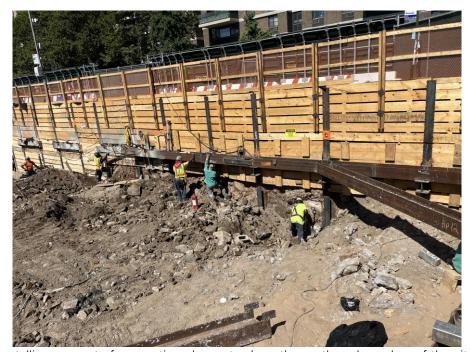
CCJV installing support of excavation elements along the northern boundary of the site (facing north)
